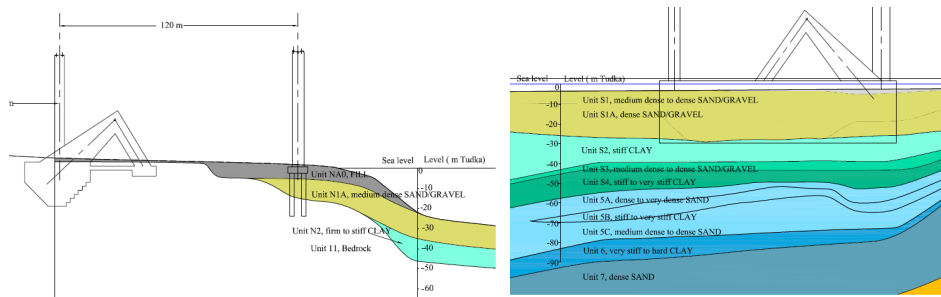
Design profiles; (a) North anchor block; (b) South anchor block
